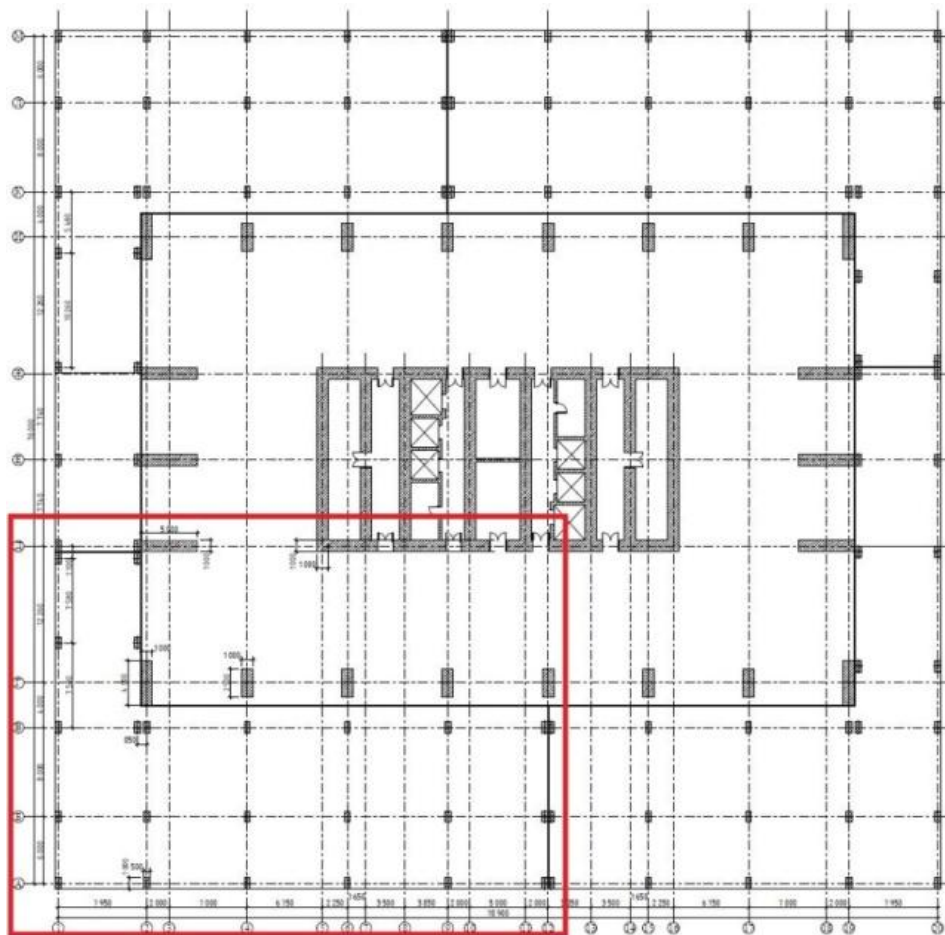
The architectural layout of the supporting structures of the high-rise building on the -3 floor. This fragment is used to simulate the local destruction of the vertical load-bearing structures
